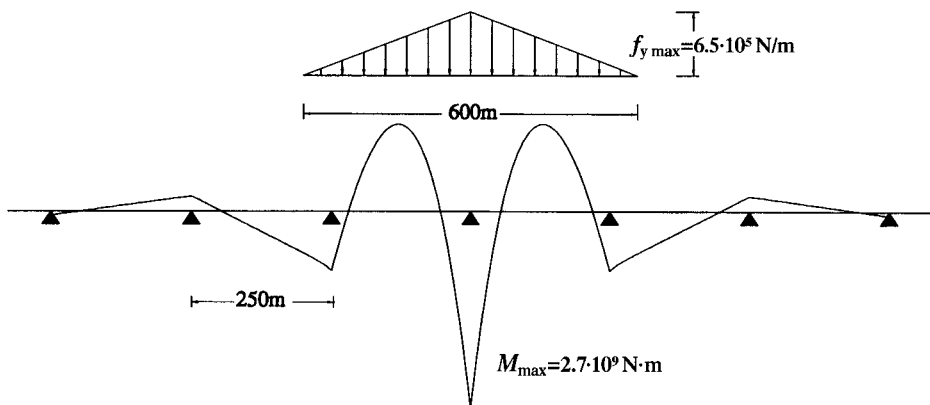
Worked example: the maximum horizontal wave load on the tunnel and the bending moment.
